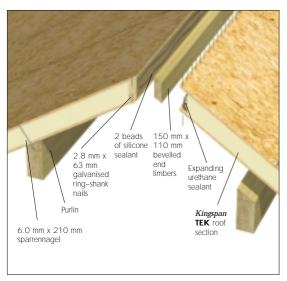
INSTALLATION OF ROOF SECTIONS WITH NO RIDGE BEAM
